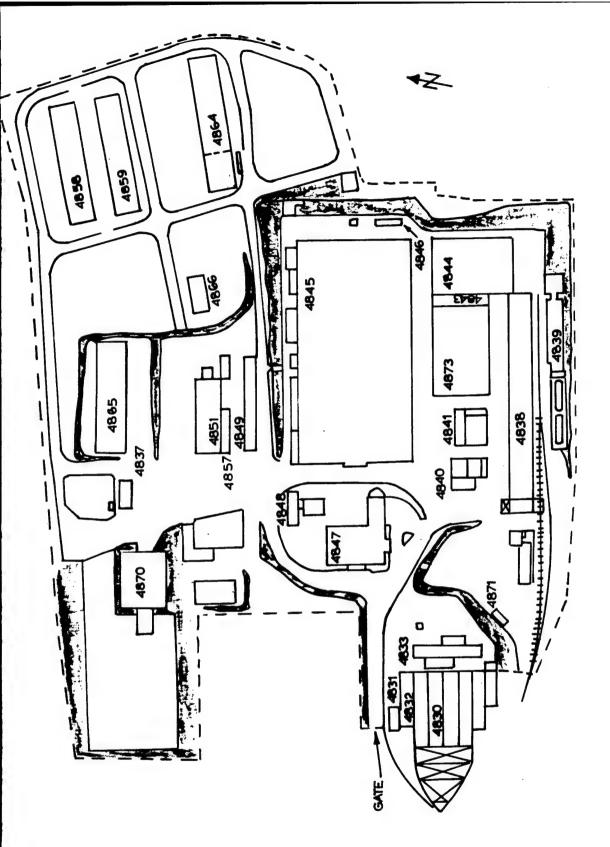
OBER – RAMSTADT DEPOT SITE PLAN
